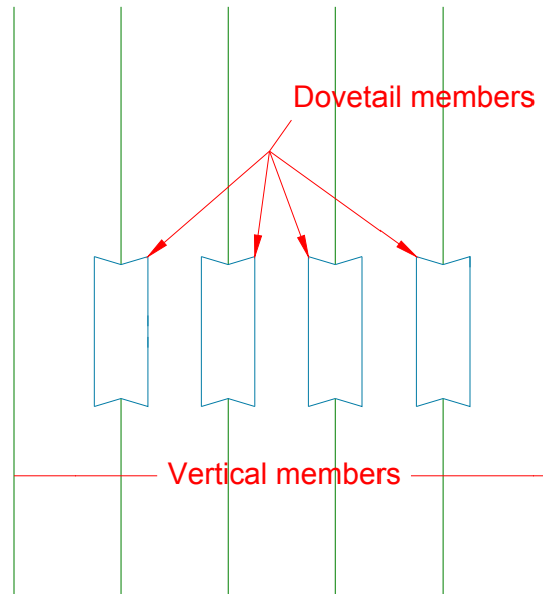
Panel Side View of Horizontal Dovetail Members
